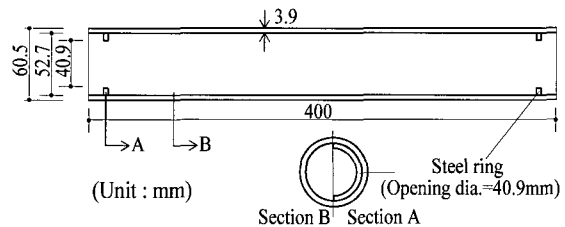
Section of pipe splice sleeve used in test of A.Einea (D25 rebar)
